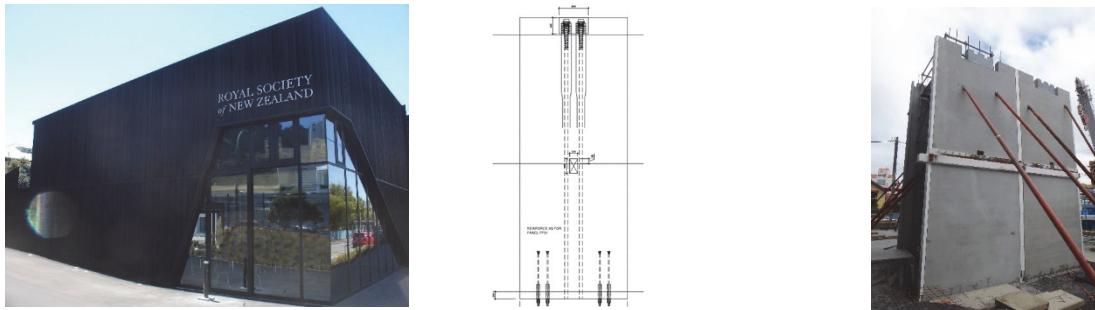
External view and typical rocking wall arrangement, and walls during construction.
